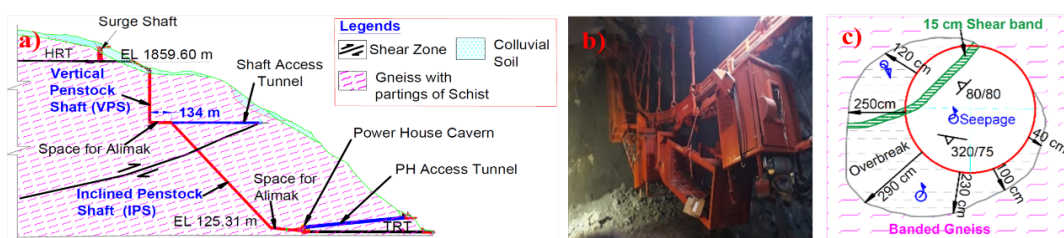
a) Longitudinal section of Shaft; b) Alimak Raised Climber Machine; c) Typical Overbreak section.
